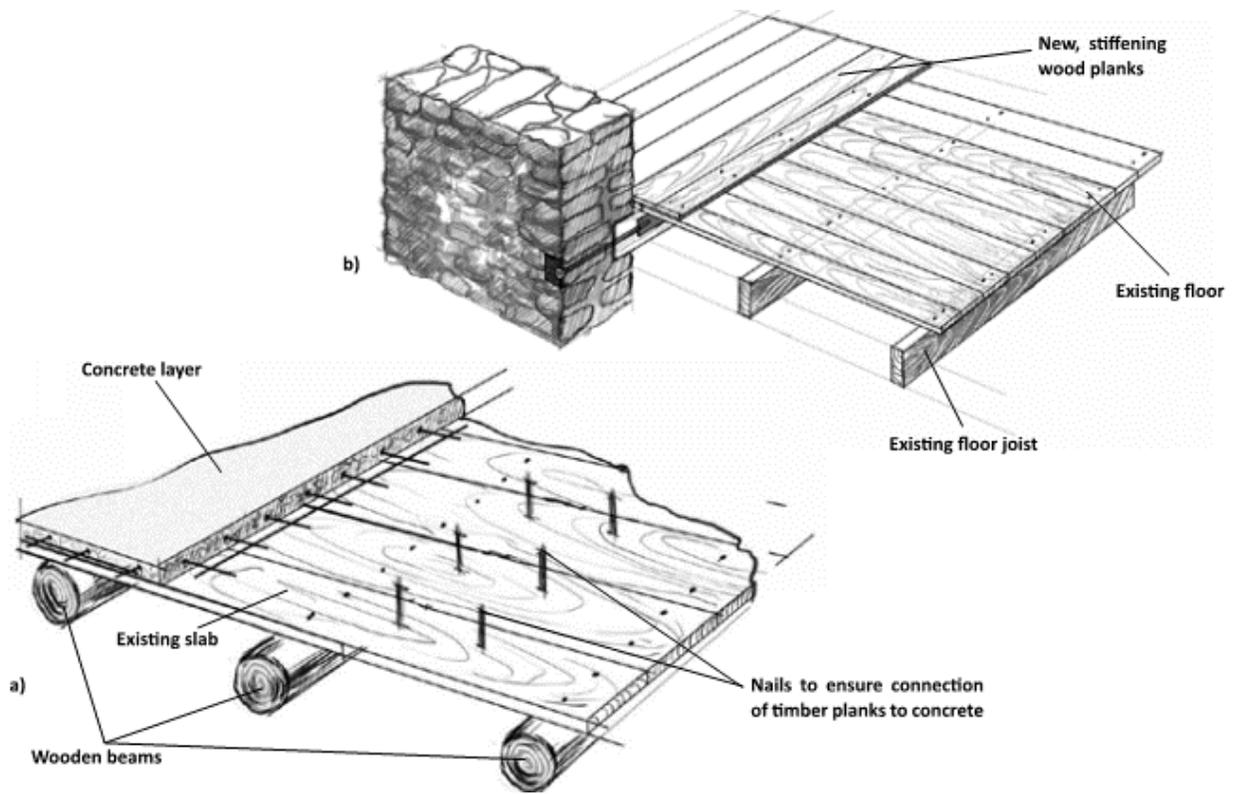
Stiffening of the floor diaphragm by: a) thin RC topping, b) timber planks (Bothara & Brzev, 2011).
